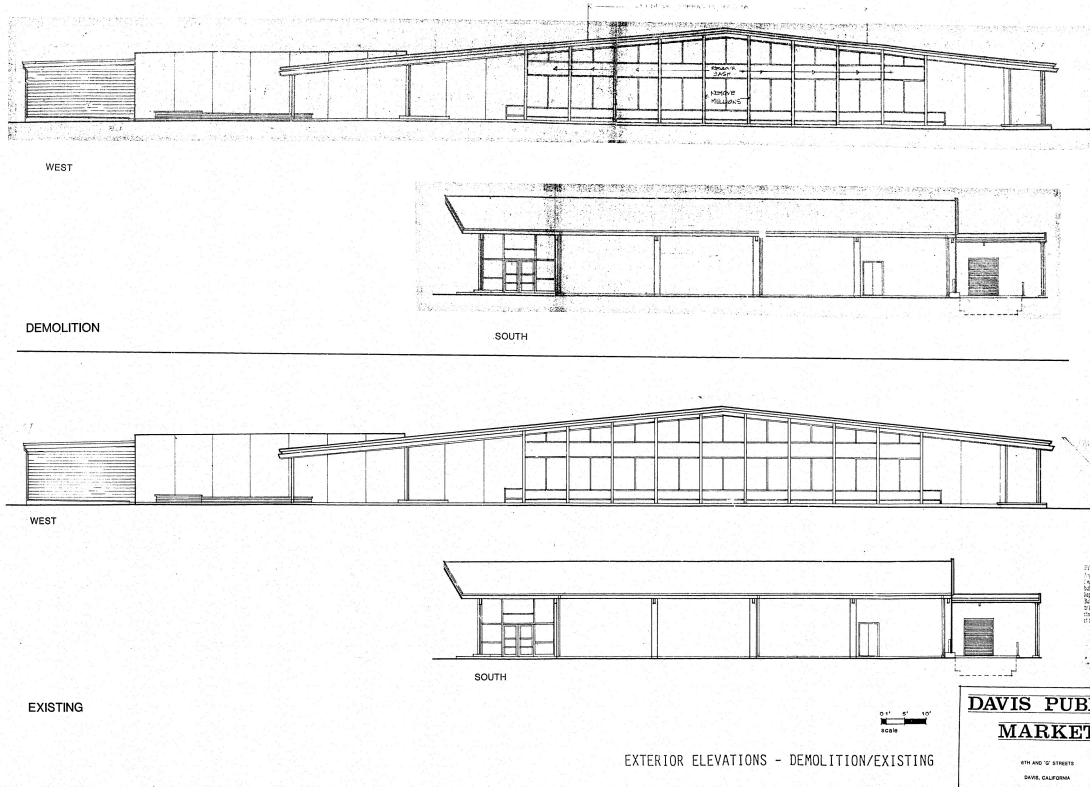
Davis Public Market existing elevation from plans for proposed remodel, c1982.
